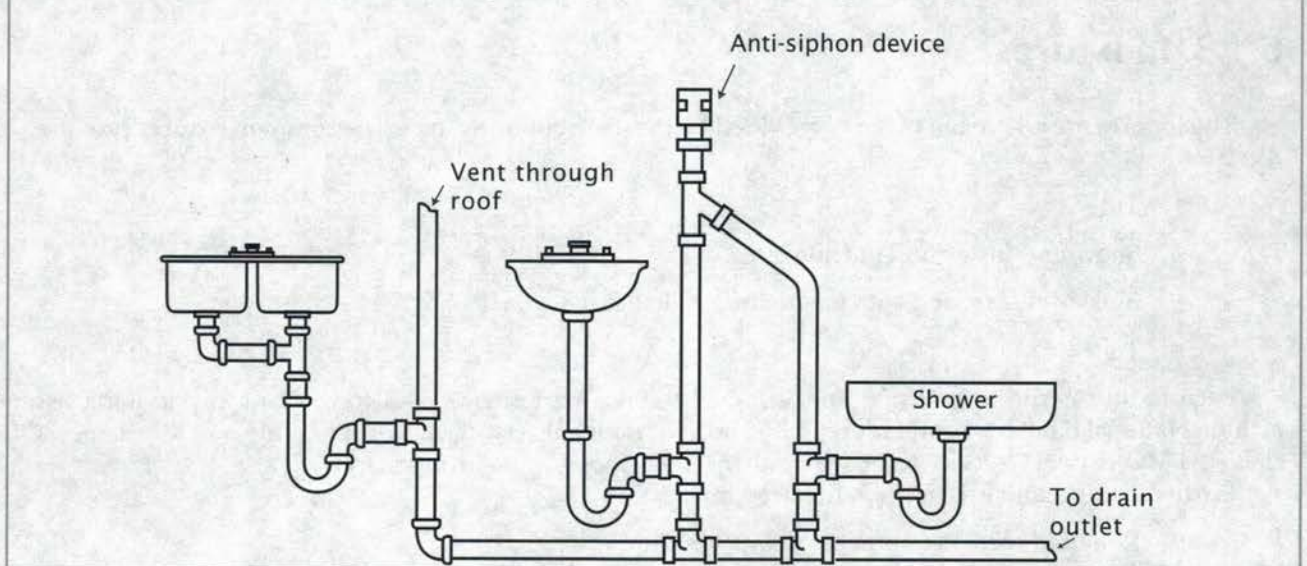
Methods of Venting (ASTVD, Roof Vent, and Connection with Vented Waste Line)
